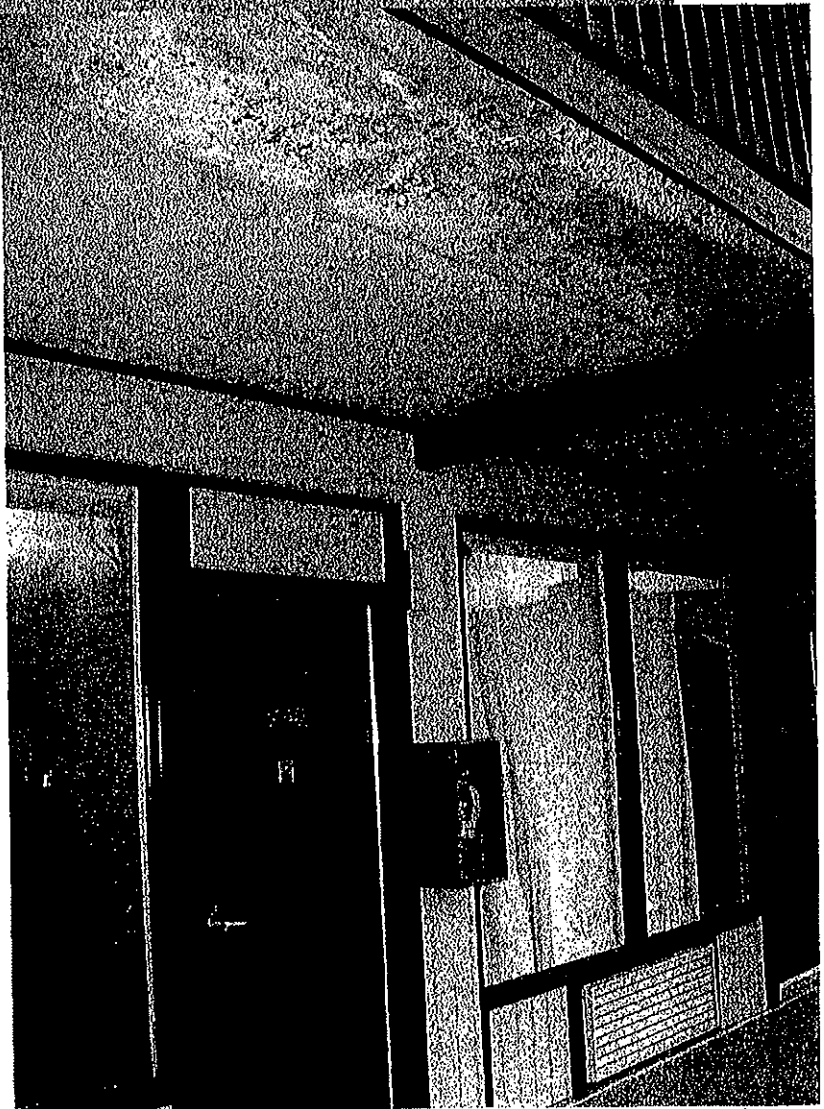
View of Exterior of Lower Level and Balcony of Woodcock Lodge
